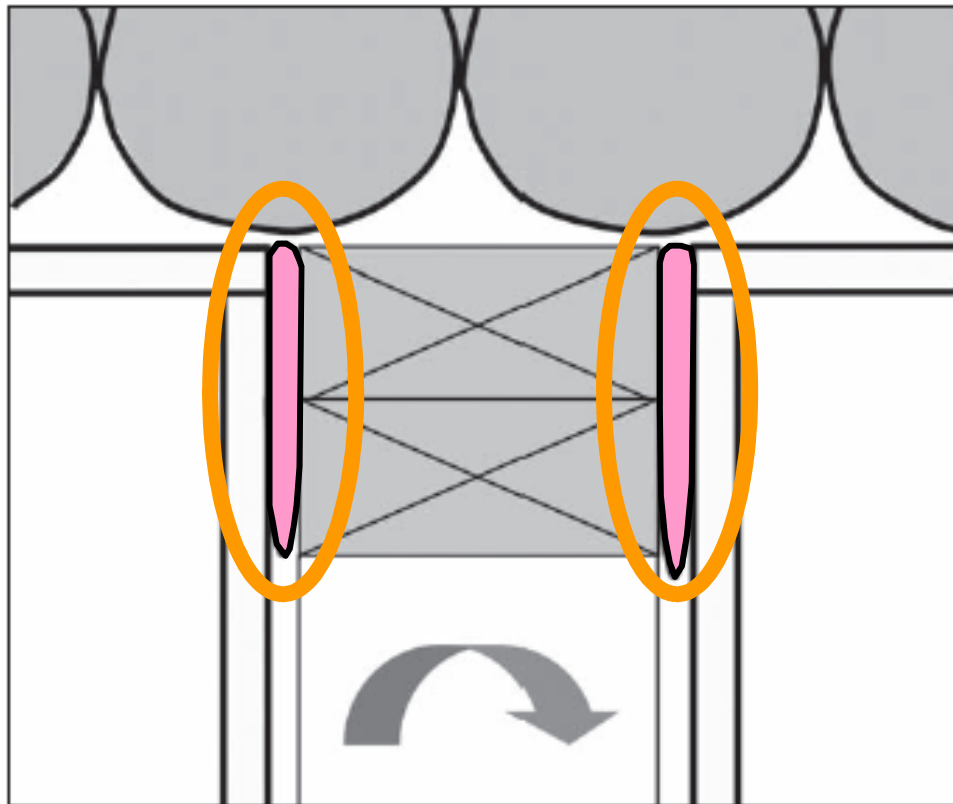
The spray foam is designed to be applied to the exposed edges of framing members, as at this double top plate at an interior partition, where it serves as an air-sealing gasket after the application of drywall.
